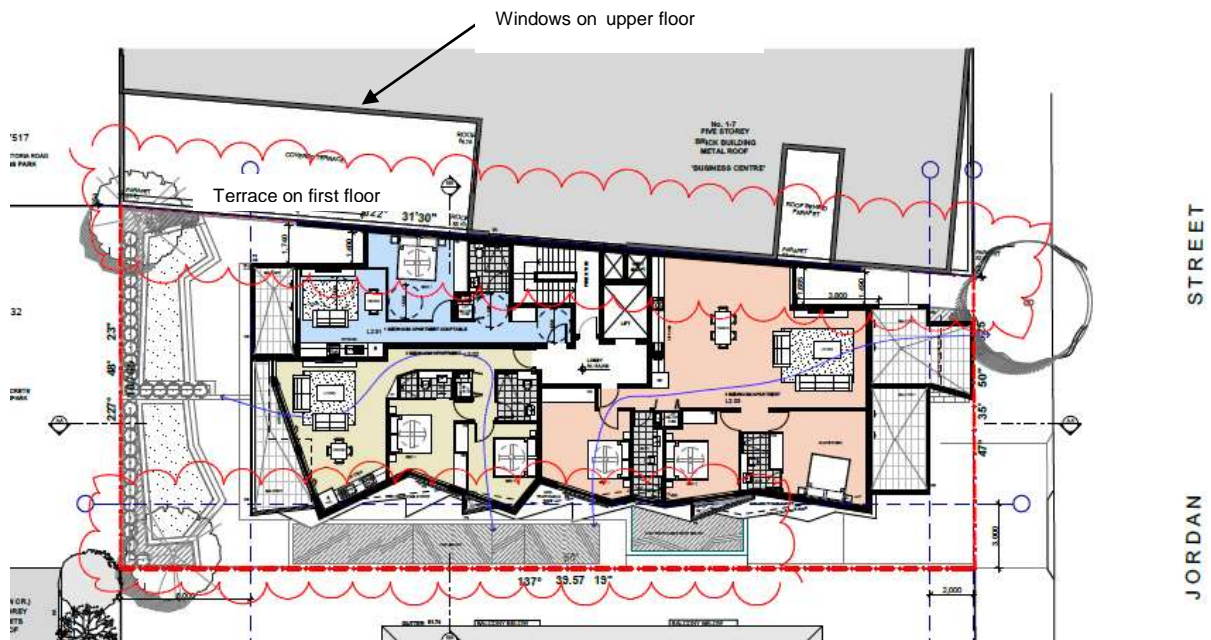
Typical floor plan of the development. This plan demonstrates the relationship of the development with the covered terrace area on the adjoining building at 1-7 Jordan Street.
